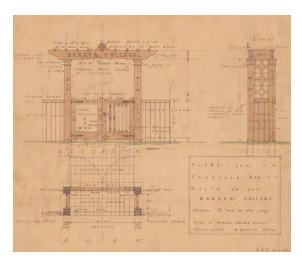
Diazo print containing elevation, section and plan for the new gate at Barker College, by Cyril C. Ruwald, dated July 1933. (Source: Powerhouse Museum) ¹⁶⁸
